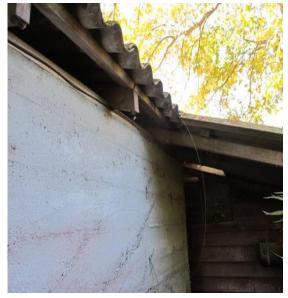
South concrete wall of west section, with timber roof rafters shown under corrugated roof sheeting.
